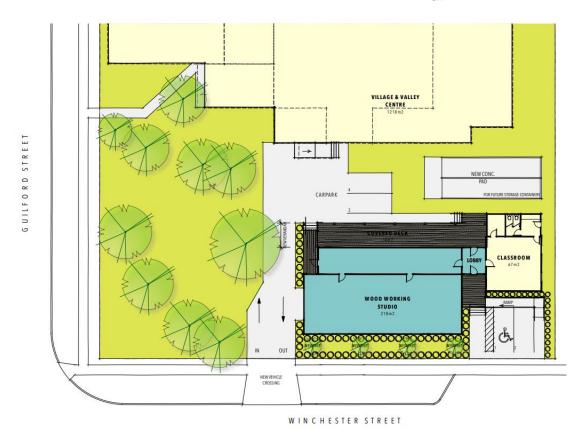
Detailed plan proposed by Ashhurst Community Trust
